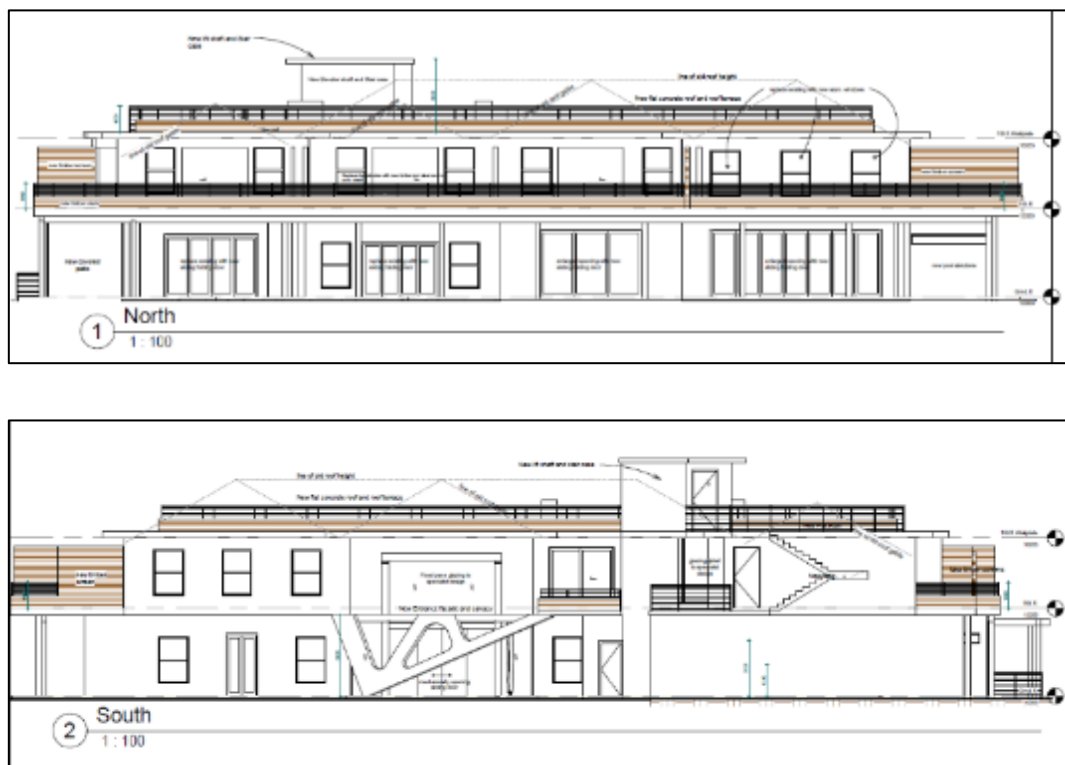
APPROVED BUILDING PLANS (NOVEMBER 2011)
